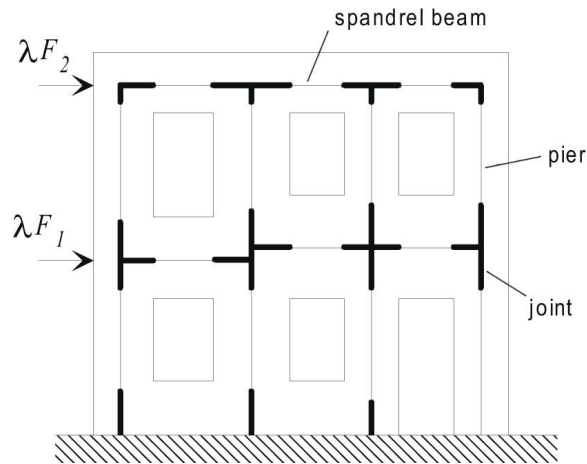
Example of an equivalent frame idealization of a masonry wall (from [Mag00] p.2)
